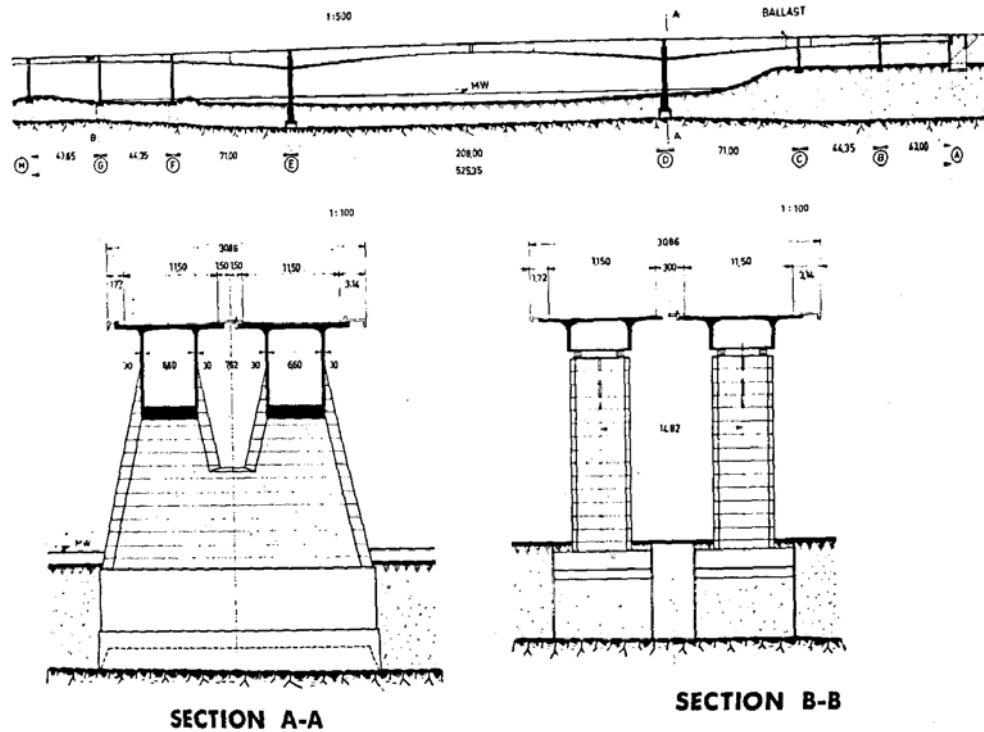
Longitudinal span and cross sections of Bendorf Bridge (Finsterwalder 1965)
